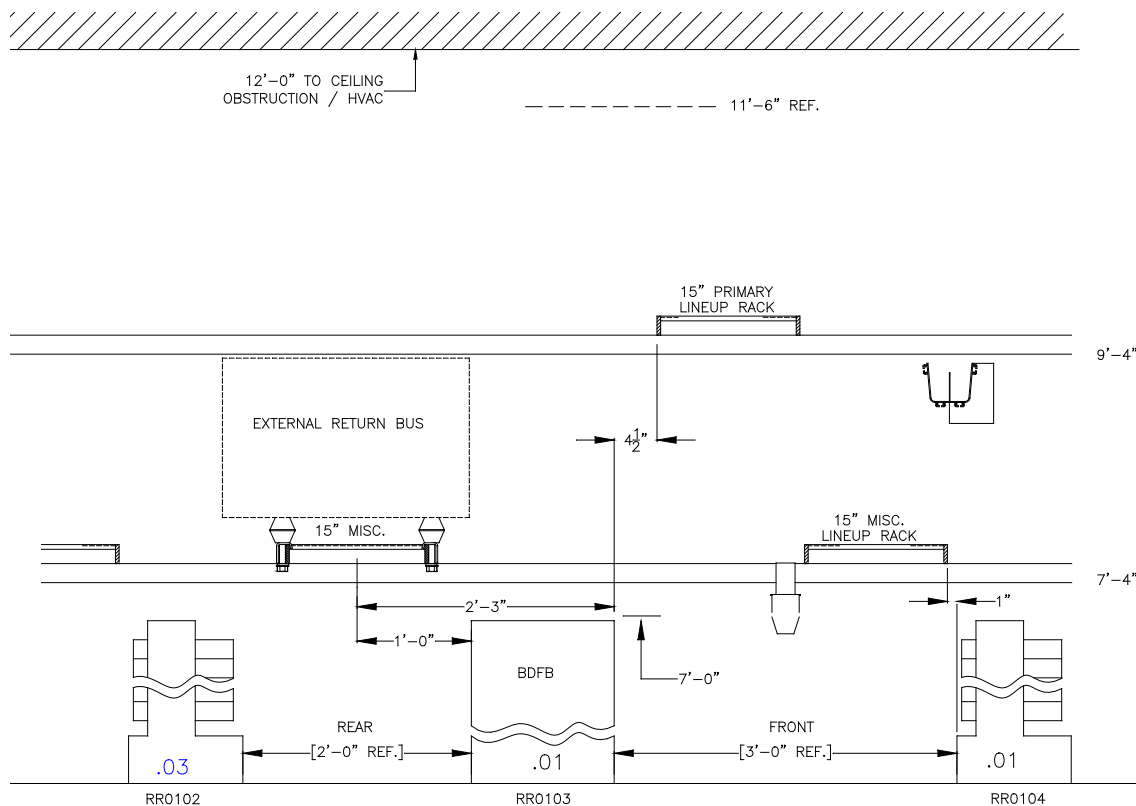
B – TYPICAL PLAN VIEW OF NEW AREA WITH 2-TIERED CABLE RACKING
